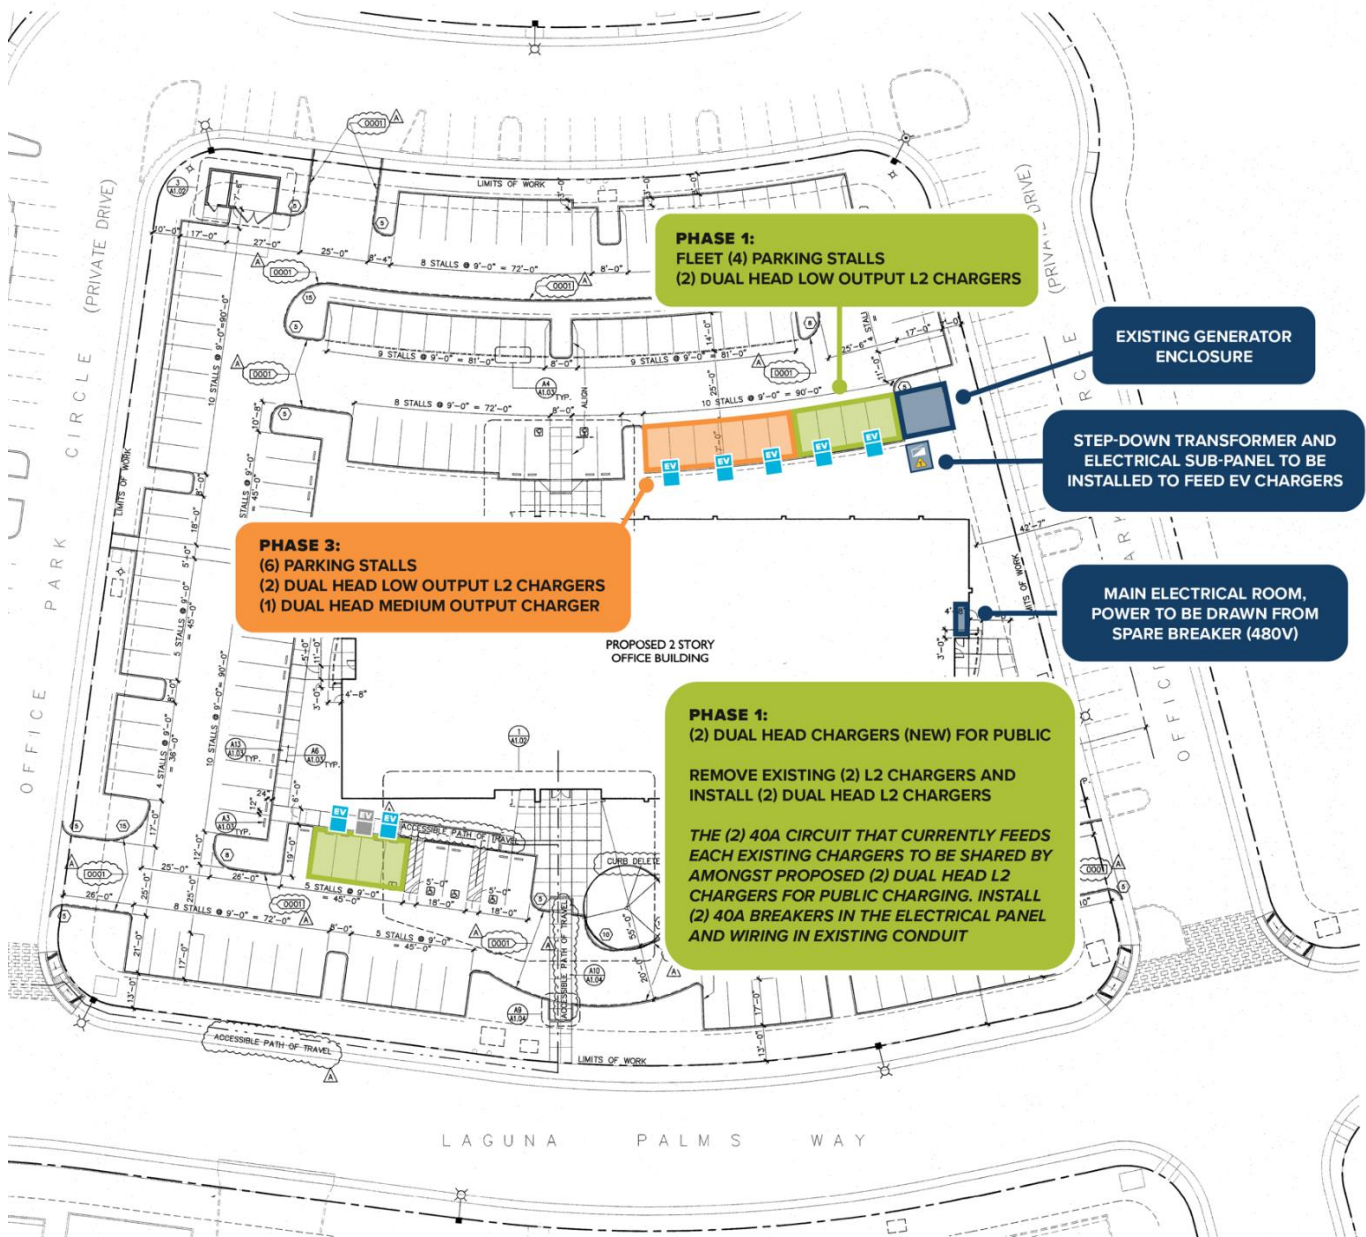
CONCEPTUAL LAYOUT OF CITY HALL
